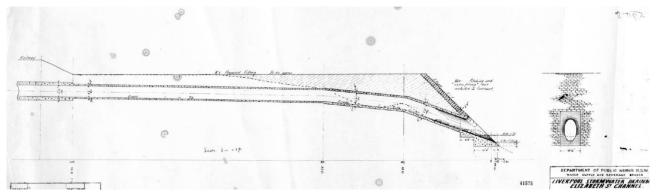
1920 plan of brick oviform drain at Elizabeth Street, Stormwater drainage channel (amended outlet details).
